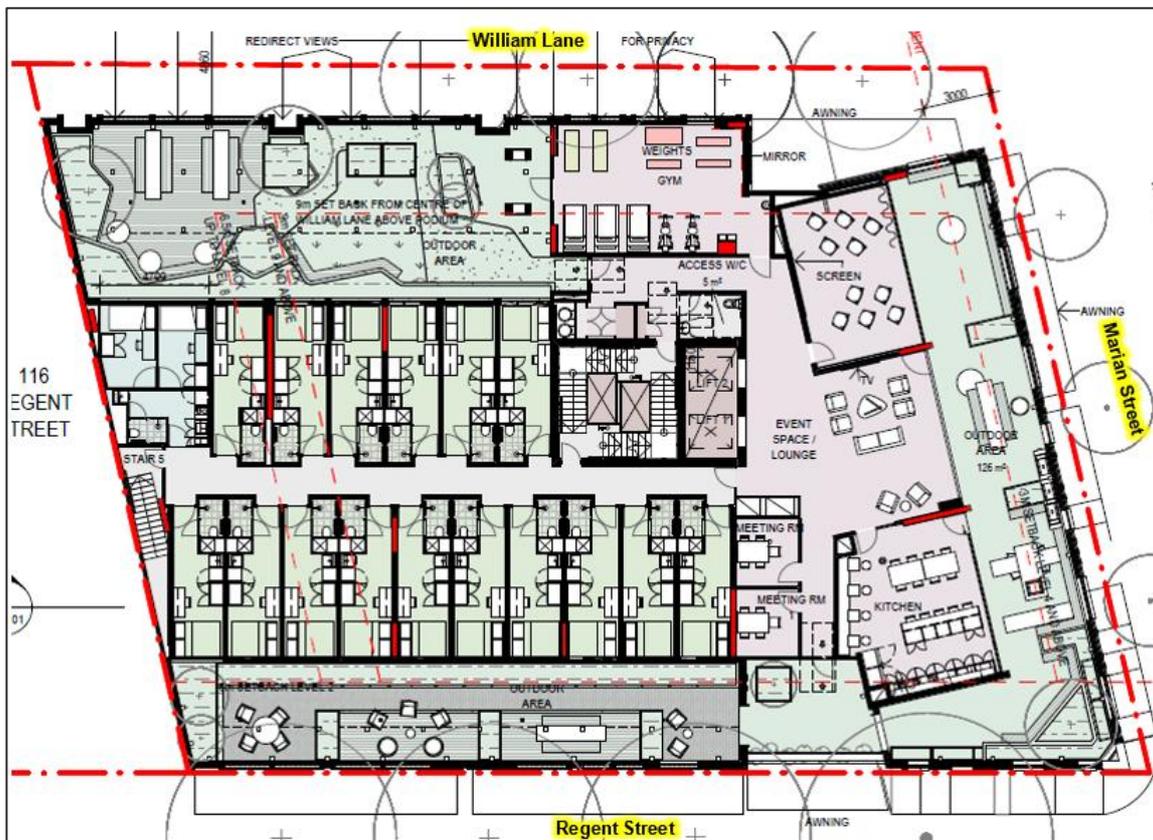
| Level 2 floor plan (source: Addendum RRTS)
